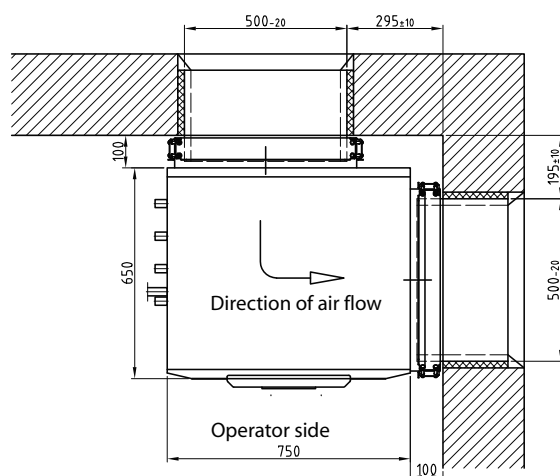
Installation in a corner 500 (LIK 8TES with air duct)
